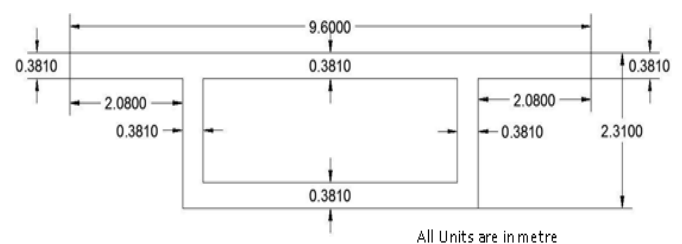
Cross Section of Simply Supported Box Girder Bridge considered for study
